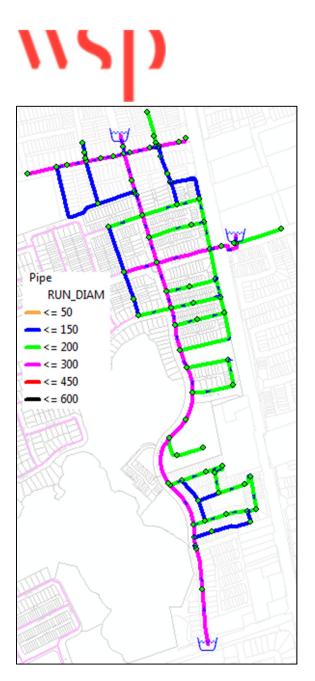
Proposed System Layout – Showing the Proposed Watermain Layout and Sizes for Phase 1.
